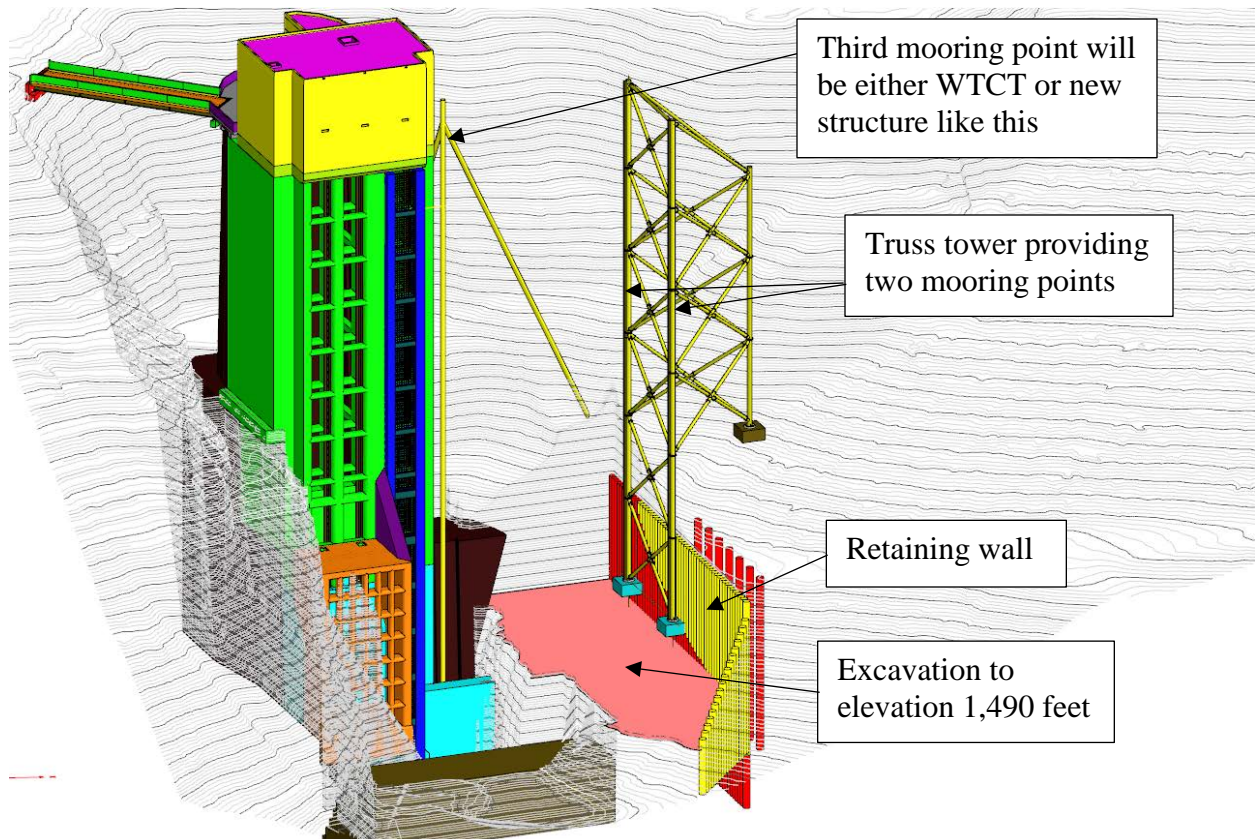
Retaining Wall, Excavation, and Mooring Truss Tower Concepts
